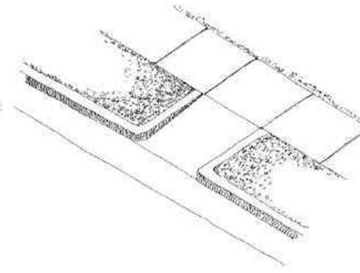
Returned curbs may be used when the curb ramp is located outside the pedestrian walkway, such as in a planting strip.
